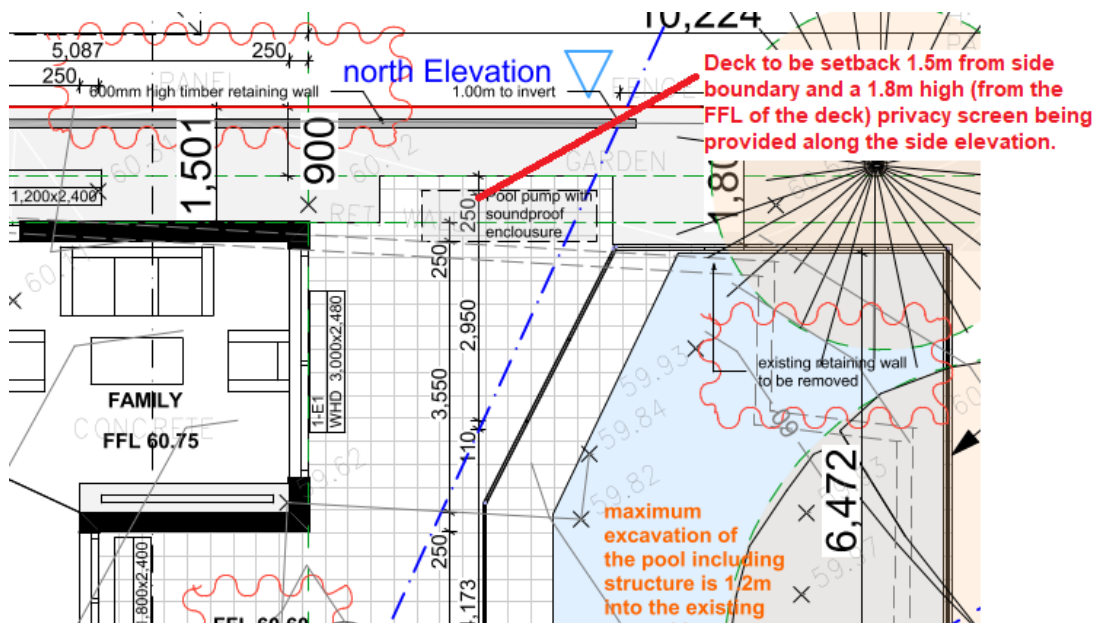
As the deck is elevated, Condition 34 has been imposed requiring the deck to be set back 1.5m off the boundary and a 1.8m high privacy screen provided along this elevation.
